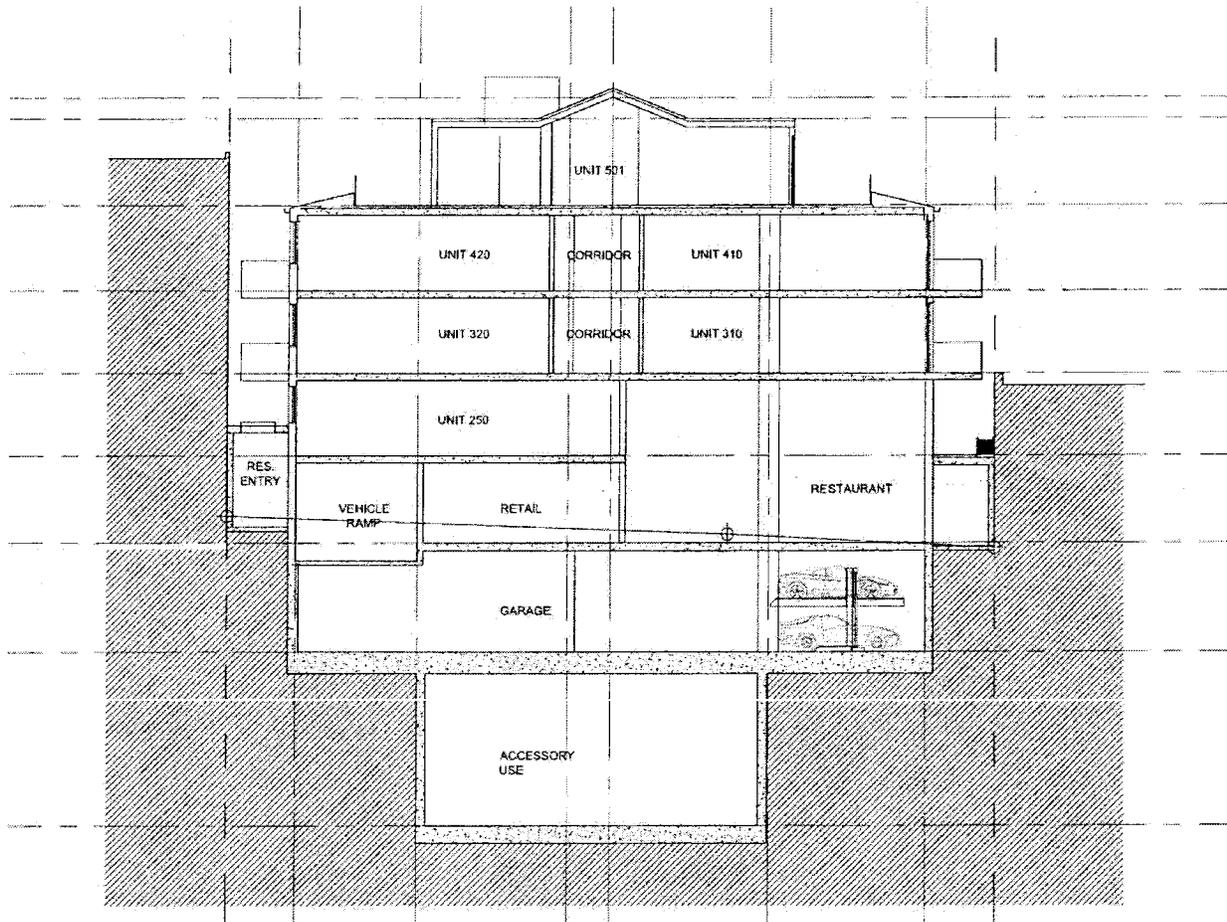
PROPOSED 1731 POWELL ST NORTH-SOUTH SECTION
